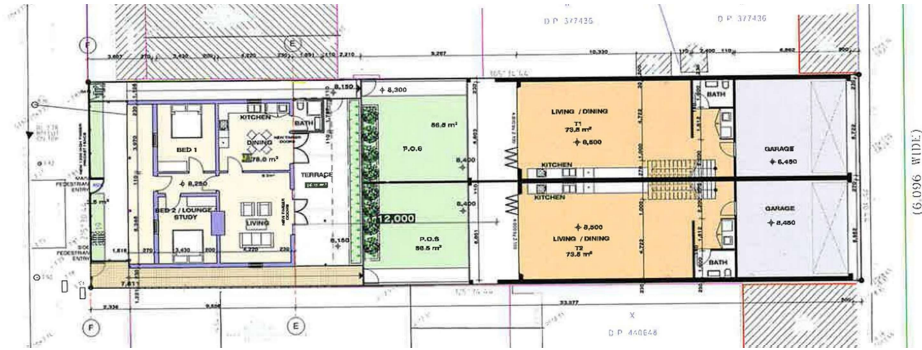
Ground floor plan showing the proposed changes to the cottage and the layout of the terraces behind. (Source: Urbanlink)
